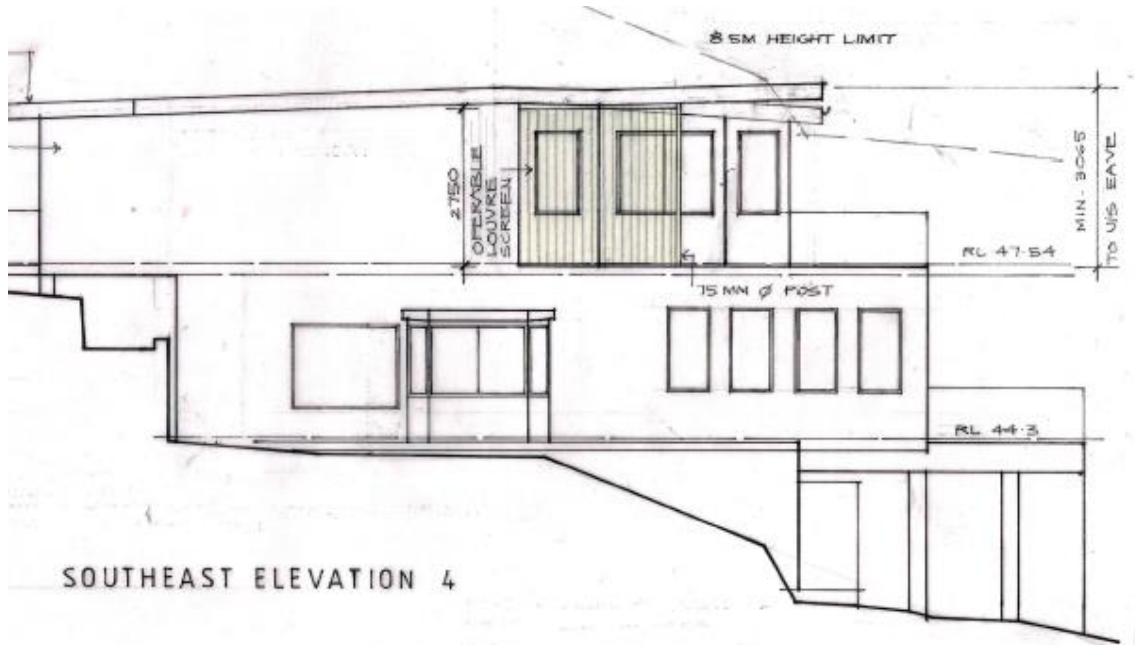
Plan extract southeast elevation (source: Shimdesign)
